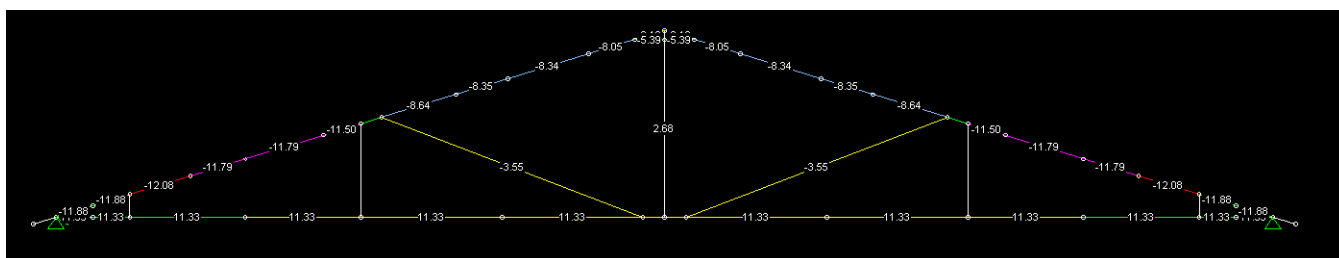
Bending diagram of Truss Design Capacity with roof battens at 400mm spacing
